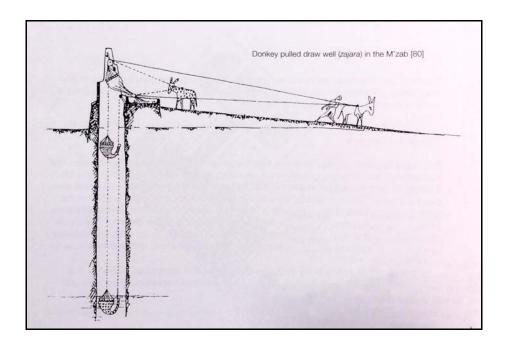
A reconstructed cross section through a Zajara well in M'zab (Ragette 2003: 66).
